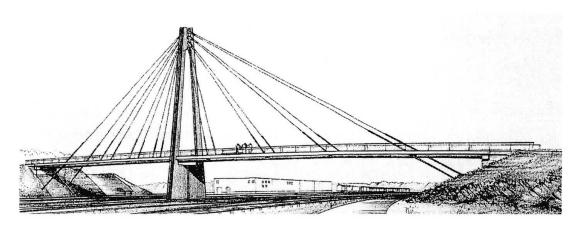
Artist's impression of Herning footbridge, courtesy Møller & Grønborg Architects and Planners
